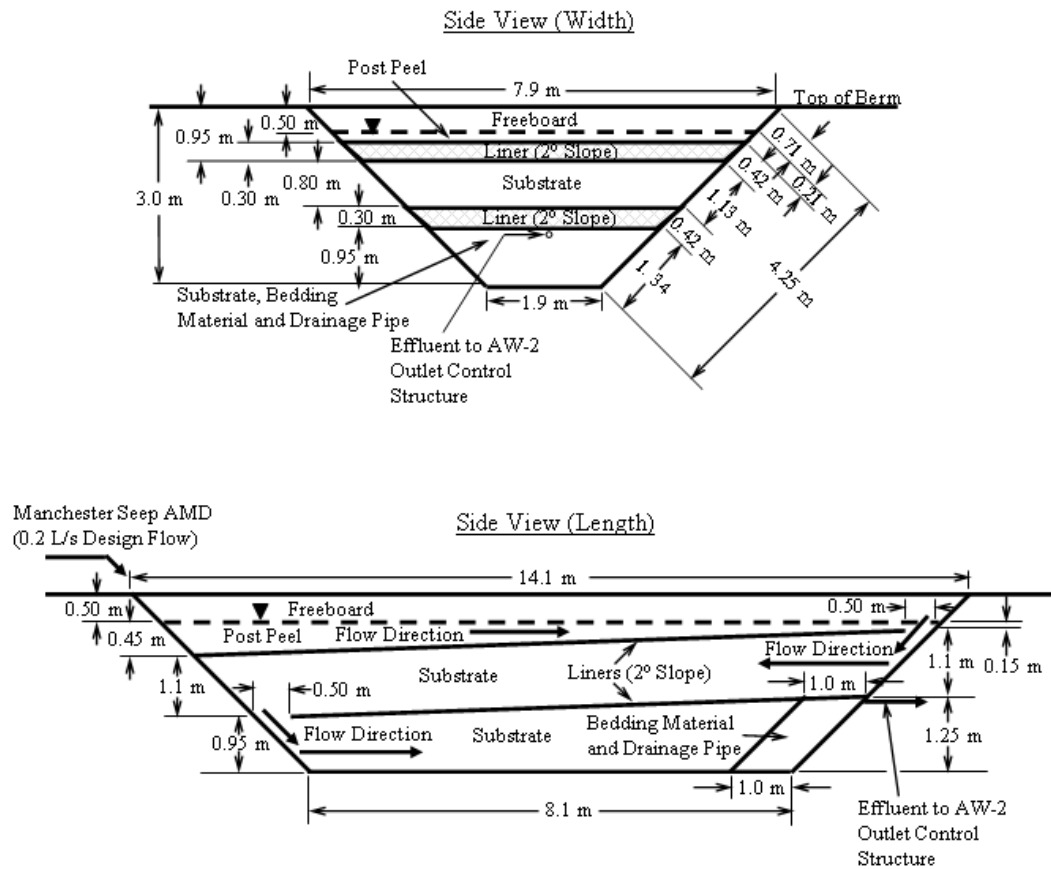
Design dimensions for the alternative flow design of the pilot-scale BGR PS-2 where two liners would be placed at a 2° slope and are used as baffles to minimise hydraulic short circuiting.
